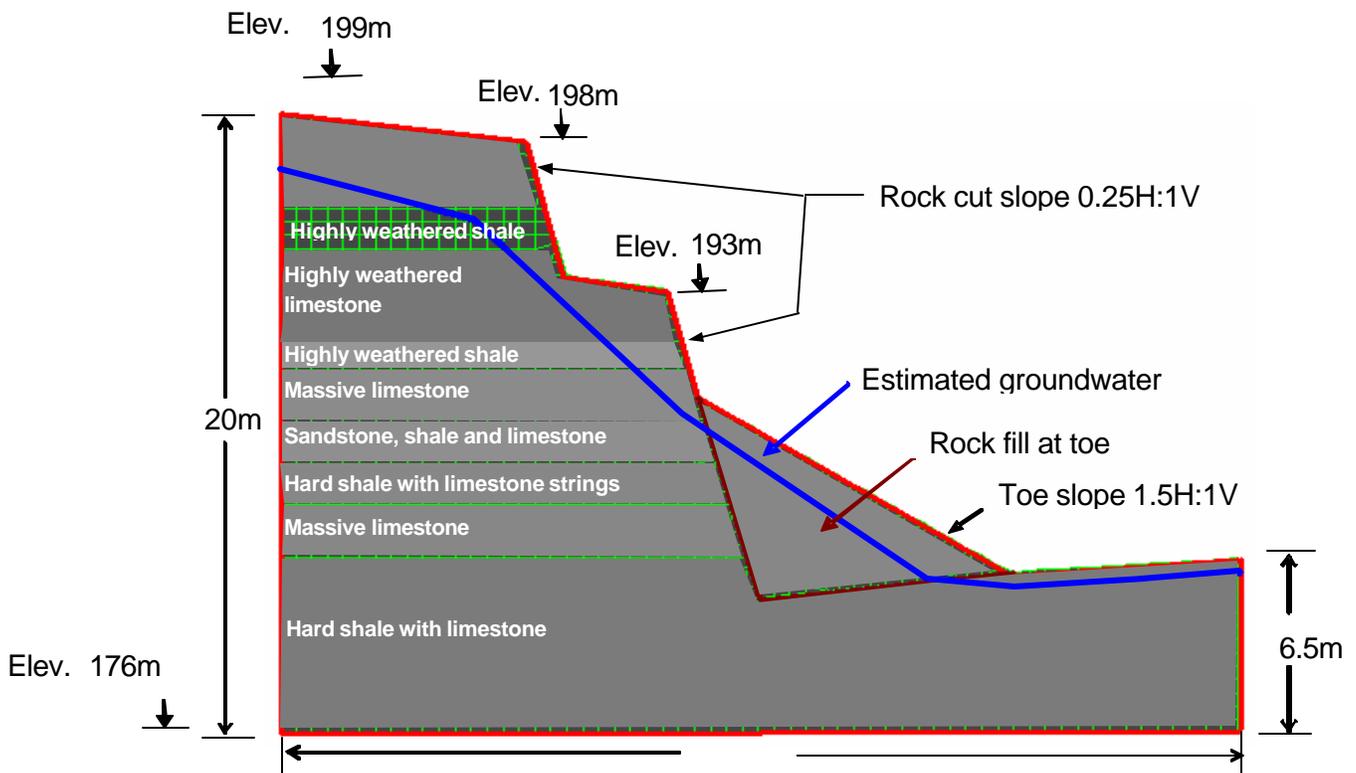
Rock slope at Station 143+00 (with the upper soil nail wall)
